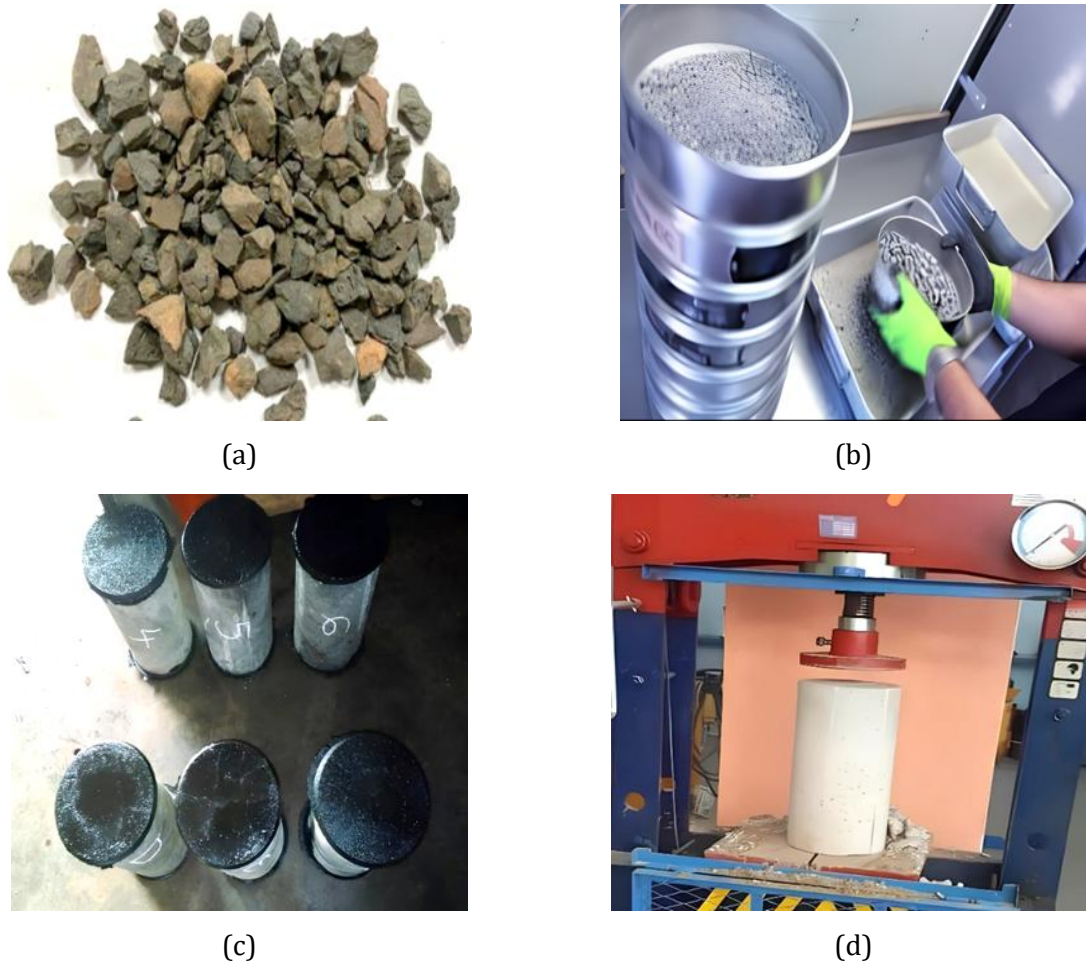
(a) Clay shale, (b) sieving operation, (c) concrete cylinder specimens, (d) concrete specimen compression testing
